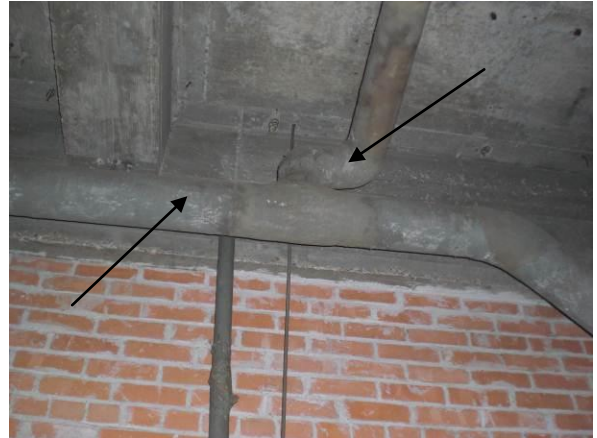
Asbestos-containing Cloth Wrapped Aircell Thermal System Insulation Run Insulation (Gray) and Cloth Wrapped Mudded Thermal System Insulation Elbow / Fitting Insulation (Gray).
